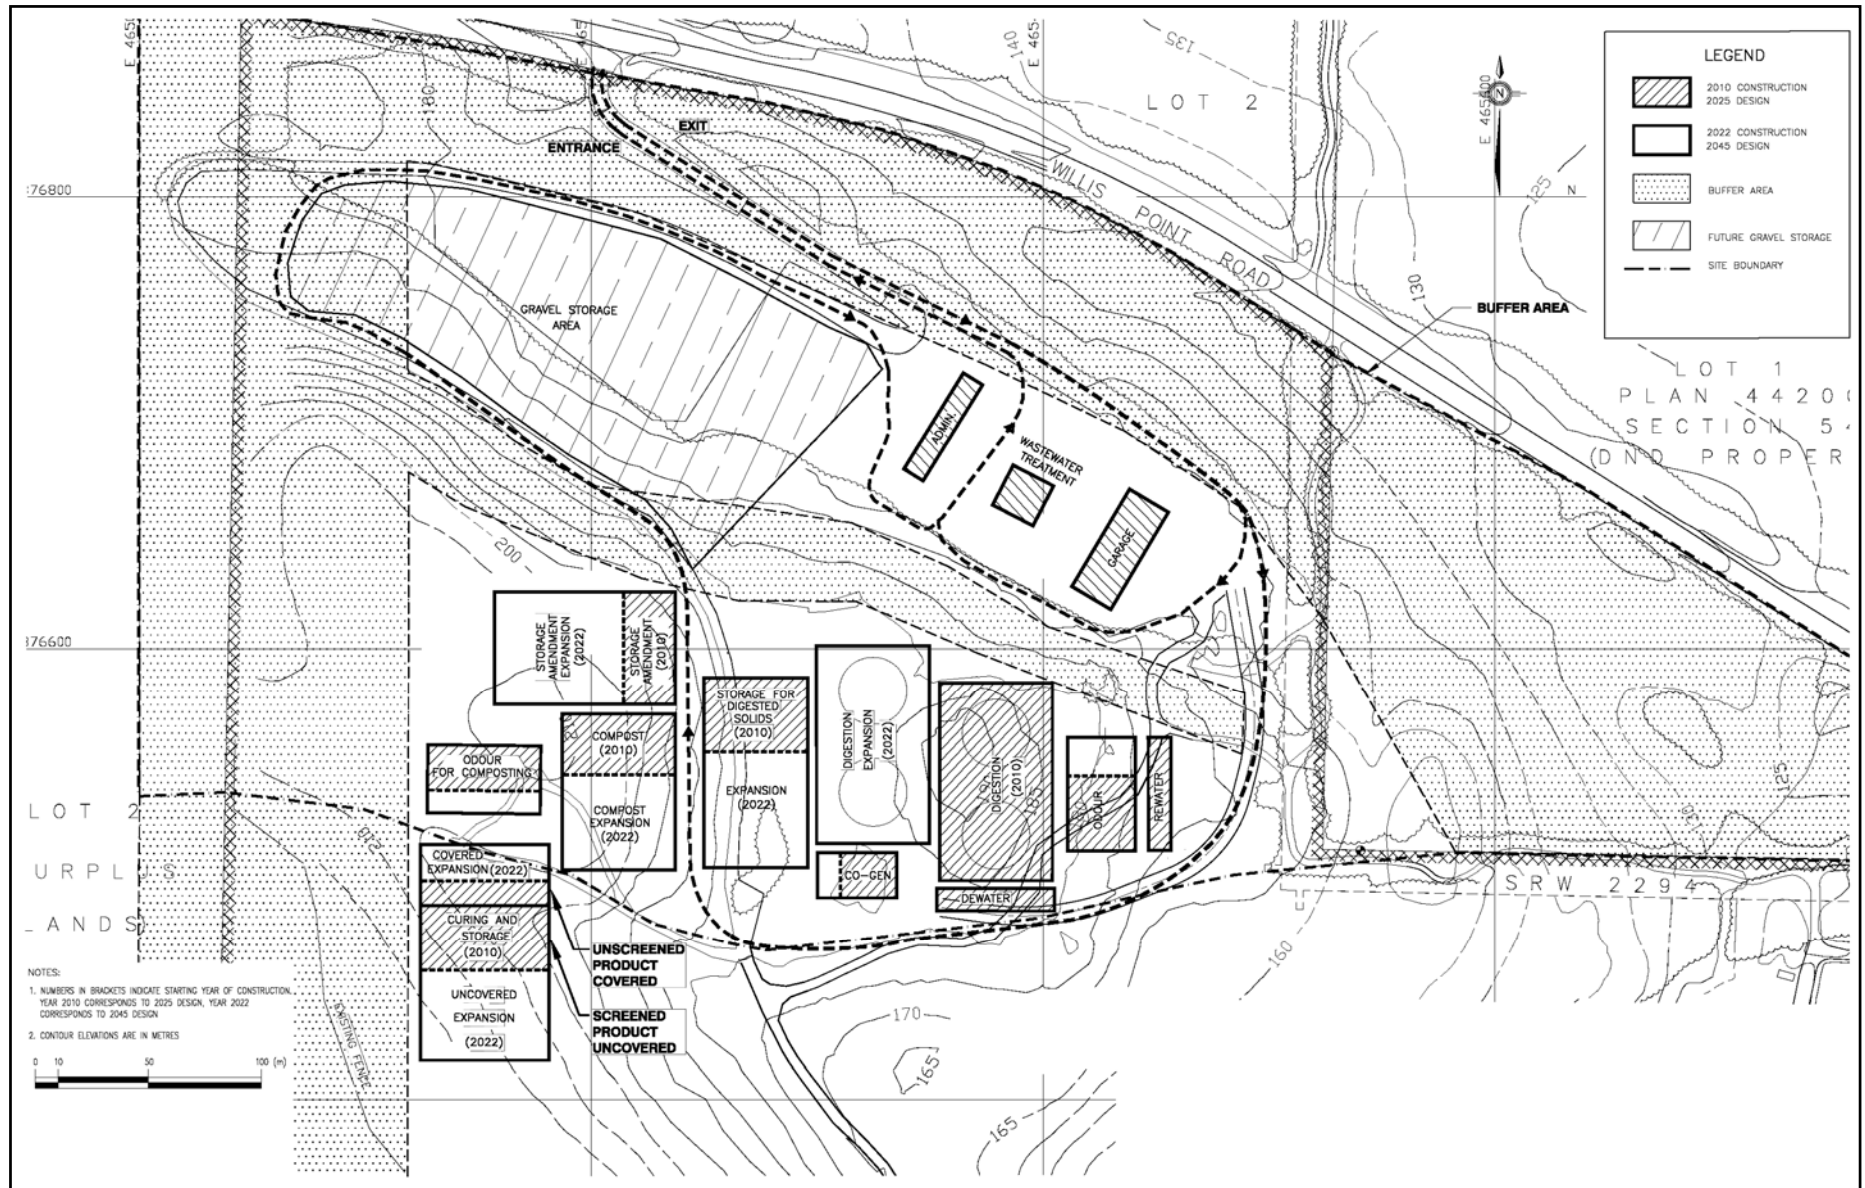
Site layout of biosolids facility at the Hartland site.
